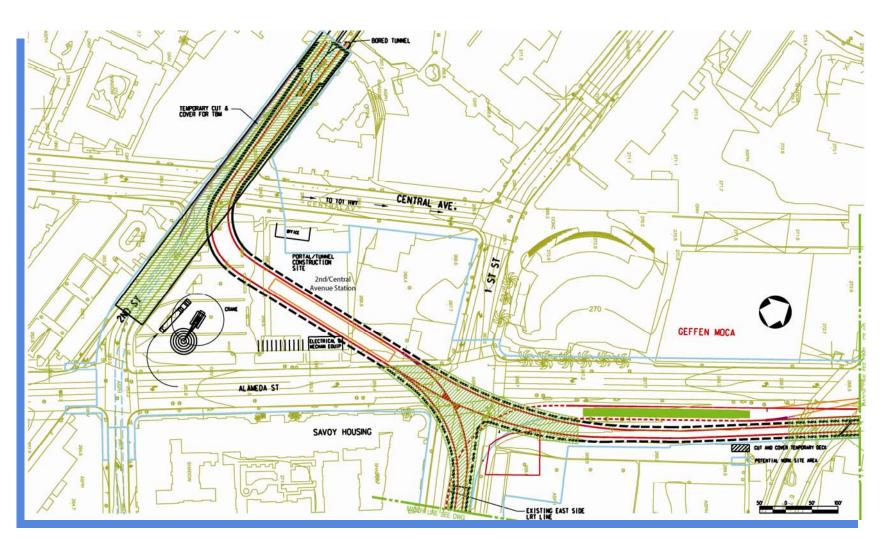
2<sup>nd</sup>/Central Avenue Station (Fully Underground LRT Alternative)
